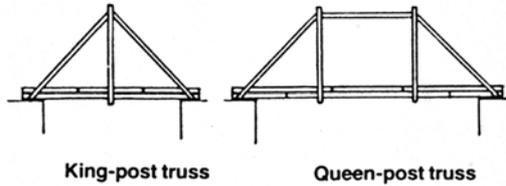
(a) King-post truss; (b) Queen-post truss. (James²)
